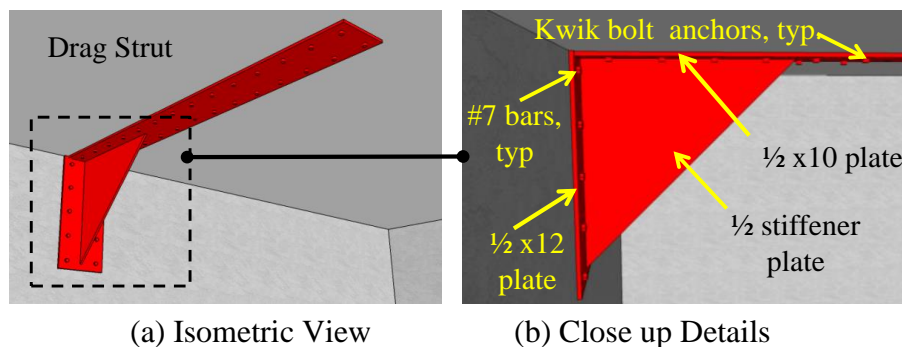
Reentrant Corner Retrofitting Scheme for Building 2
